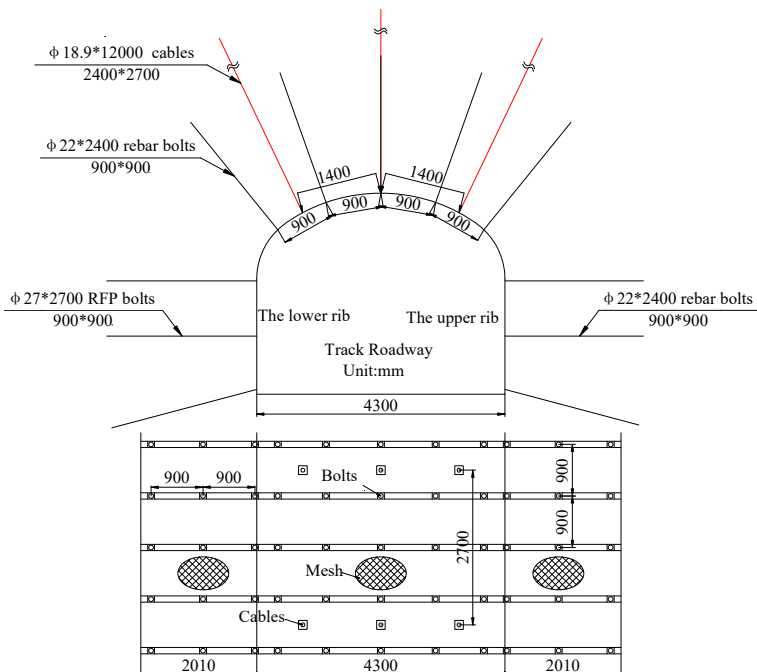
The optimal bolting scheme of the track roadway under multi-seam mining
